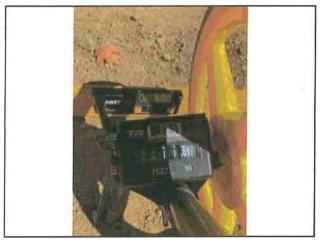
Private Access Rd Slope 19.7% Width 11'3"
